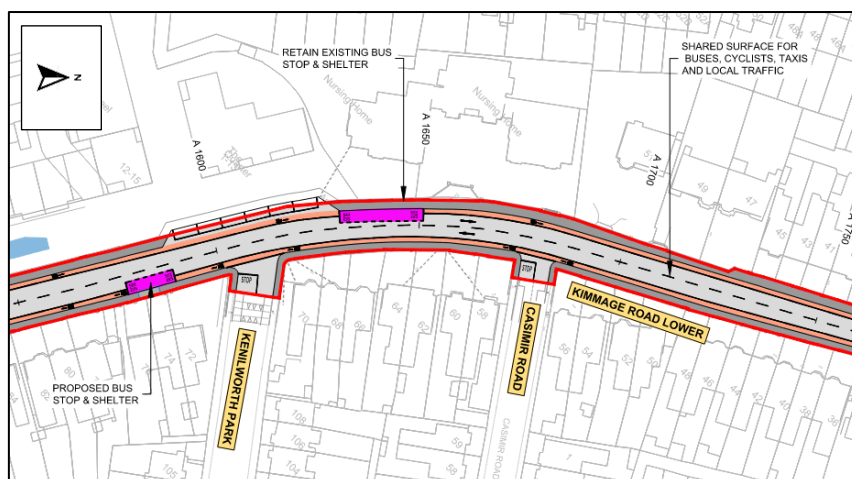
Existing Road Layout Retained on Kimmage Road Lower North of Sundrive Cross
